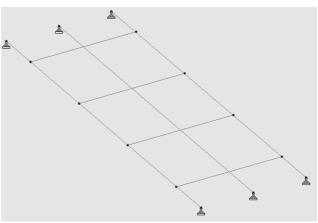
Model Of The T-Beam Deck Slab In STAAD
